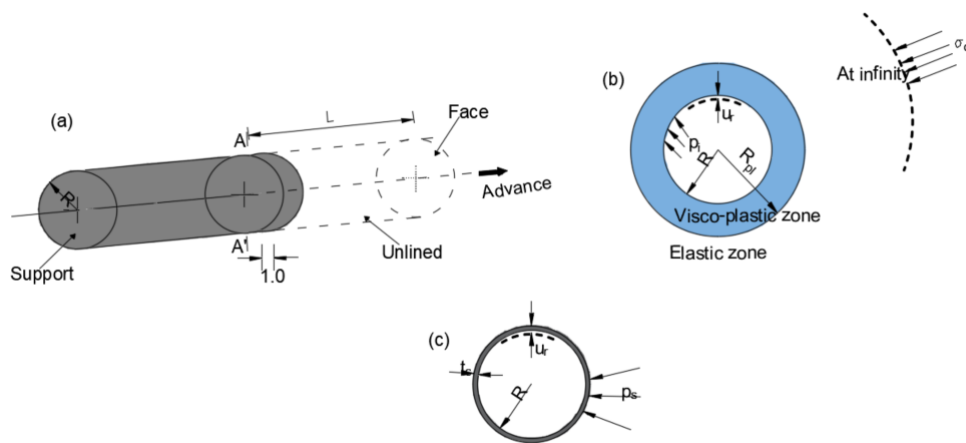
a) Cylindrical tunnel of circular Cross section of radius R b) Cross-section of circular tunnel section $A-A'$ c) Cross-section of the circular support system applied at section $A-A'$ [Redrawn after (Carranza-Torres and Fairhurst, 2000) for better readability]
